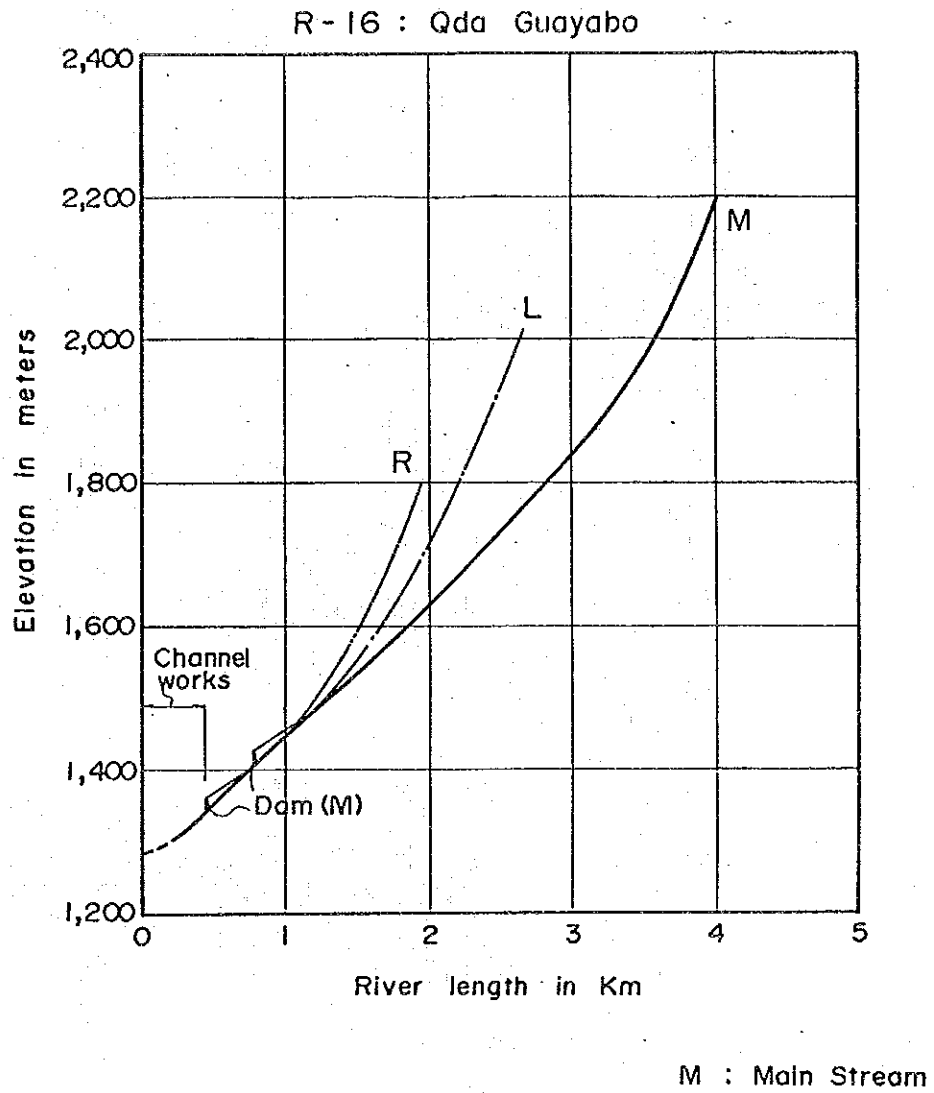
Structural Plan on Profile of Qda Guayabo (R16)
